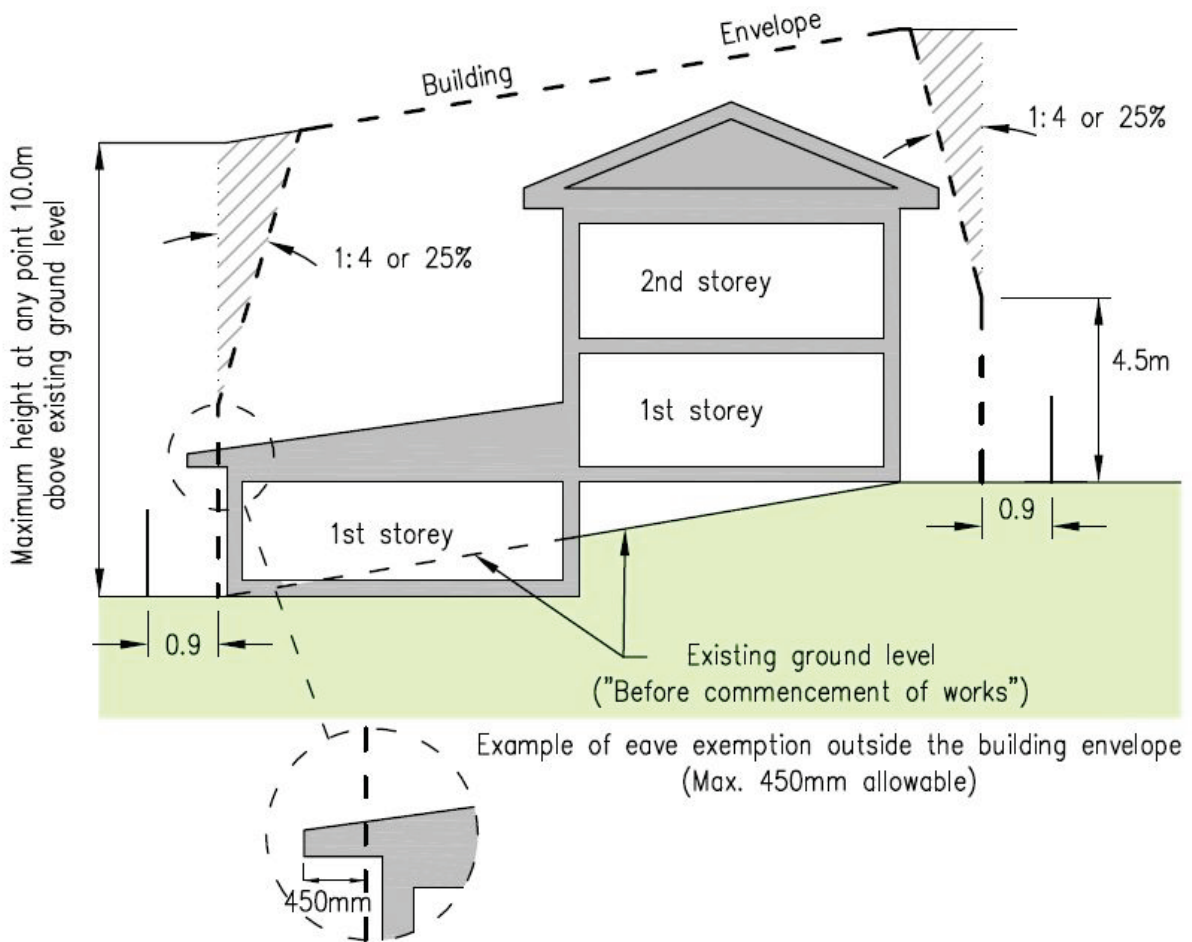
Side & Rear Setback Building Envelope Explanation (residential sized allotments)
